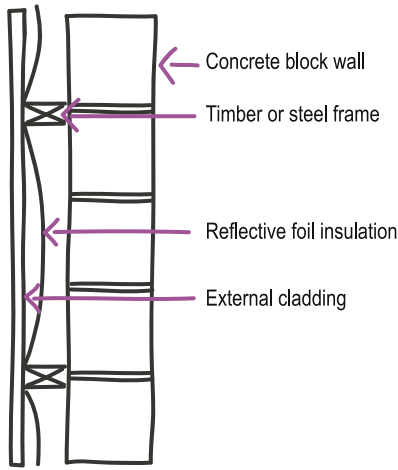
Wall cross-section showing insulation on the outside of the block wall.
